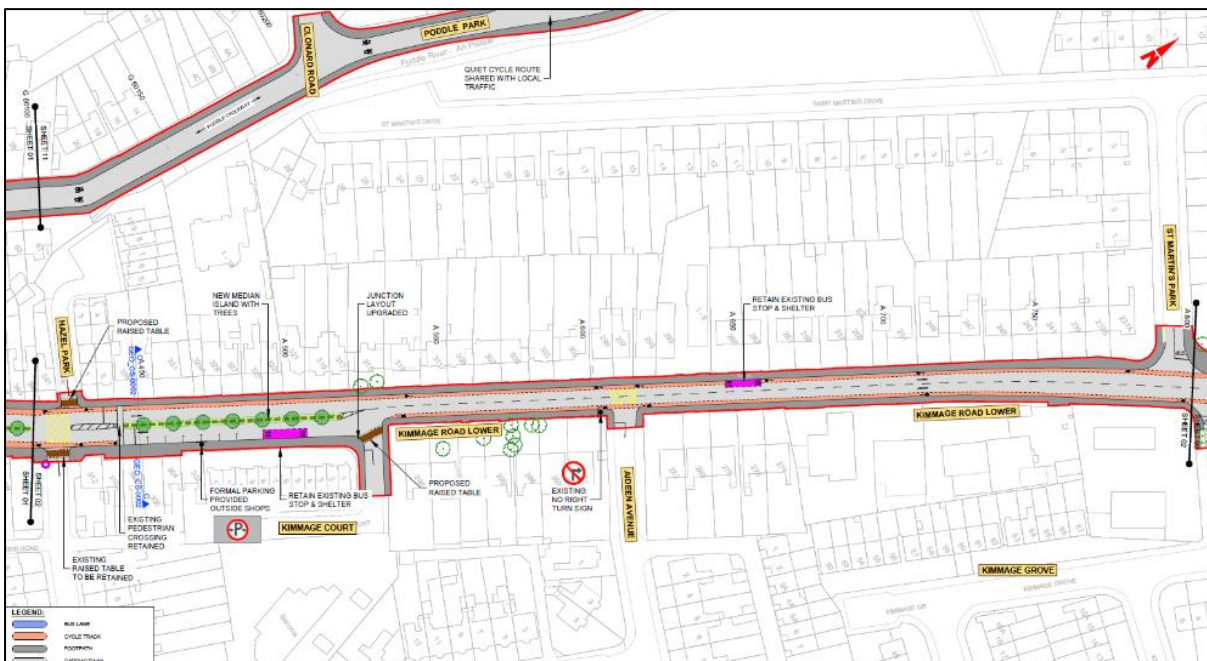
Extract from General Arrangement Drawings (Sheet 2)
